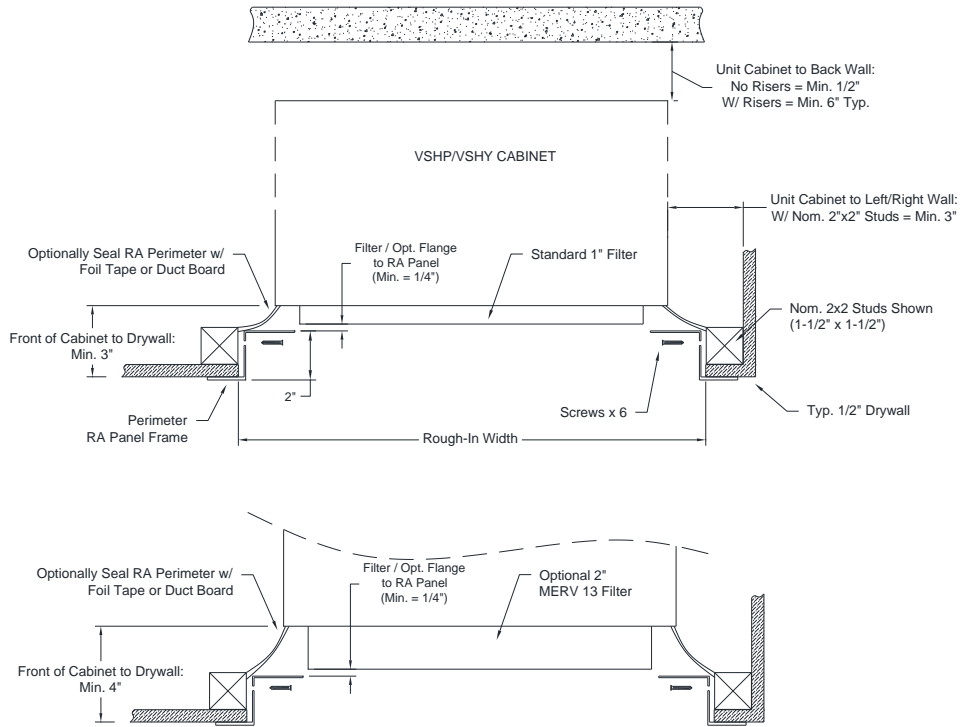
Perimeter Panel Furring Detail—Typ. 2x2 Framing Plan View
